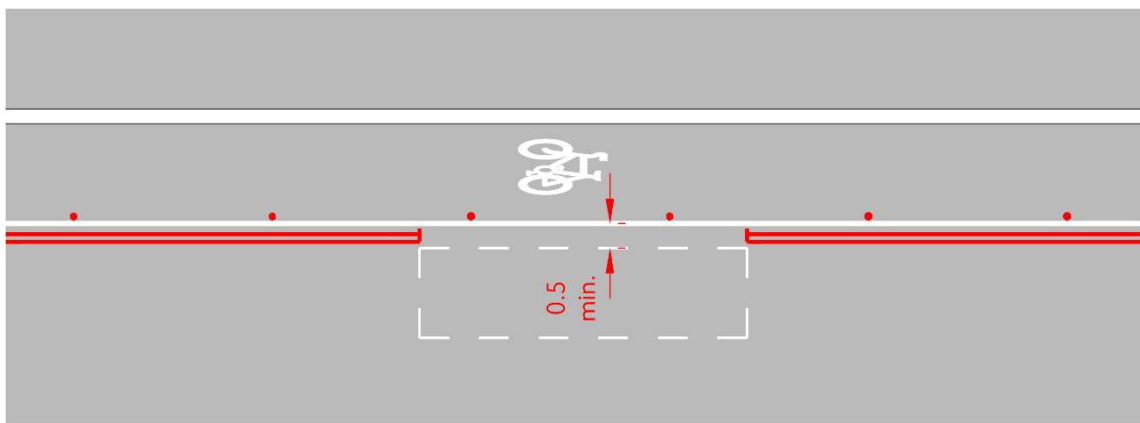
Loading and waiting restriction marking details using TSRGD diagram 1028.4b (S7-4-6)
